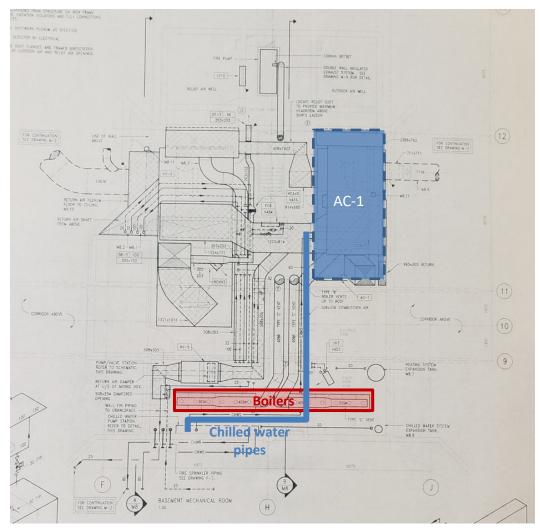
Basement mechanical room. Supply and return pipes from the existing chiller pass close to the boiler plant and heating loop.
